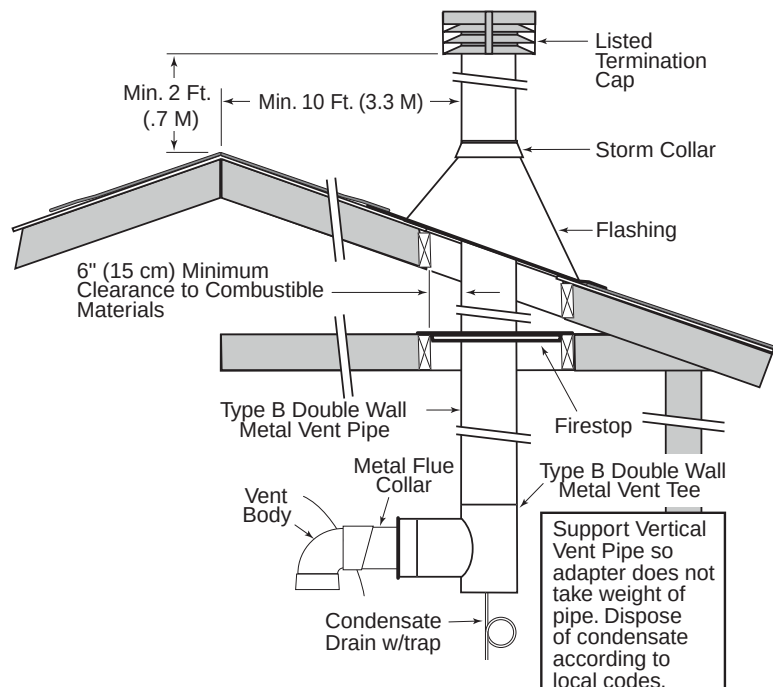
Typical Metal Vent Pipe Installation - Canada
